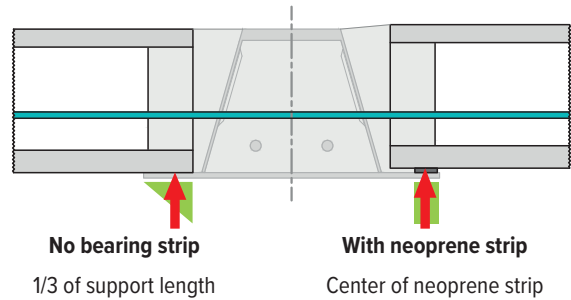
SUPPORT SITUATION IN CONSTRUCTION STAGE, AFTER GROUTING WITH CONCRETE
